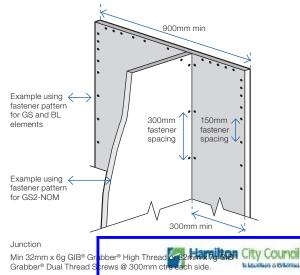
WALL INTERSECTION FASTENER PLACEMENT
